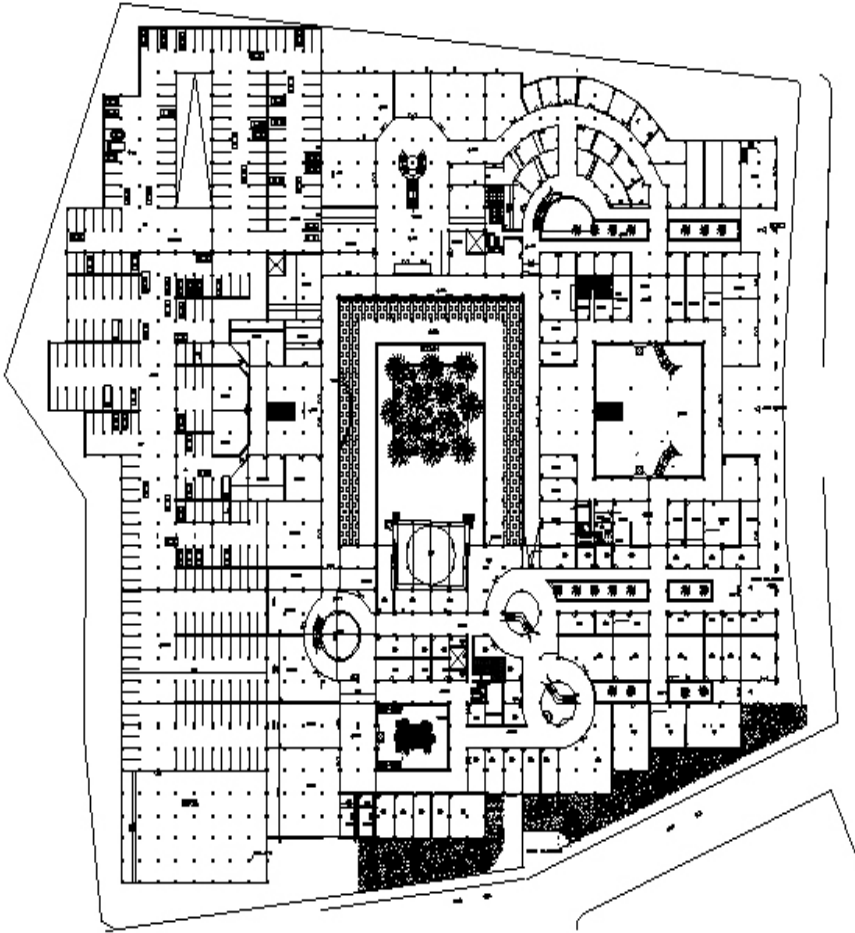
The Ground Floor Plan of Project Prepared by Isparta Government, [2]
